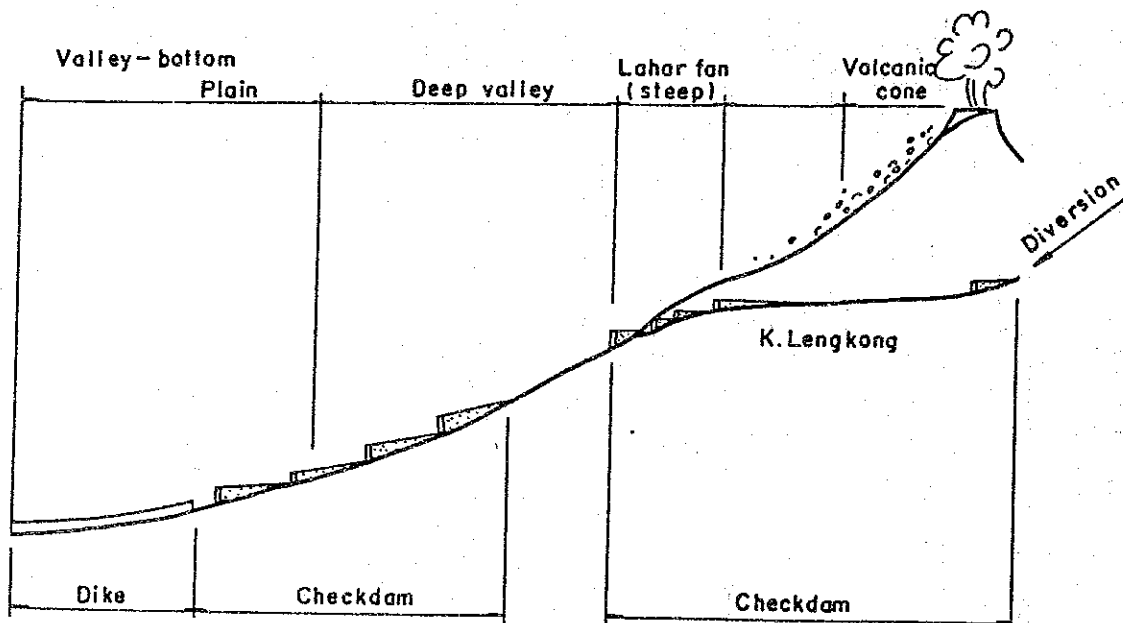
Schematic Drawing of the Plan of Sediment Control Facility in K. Glidik
